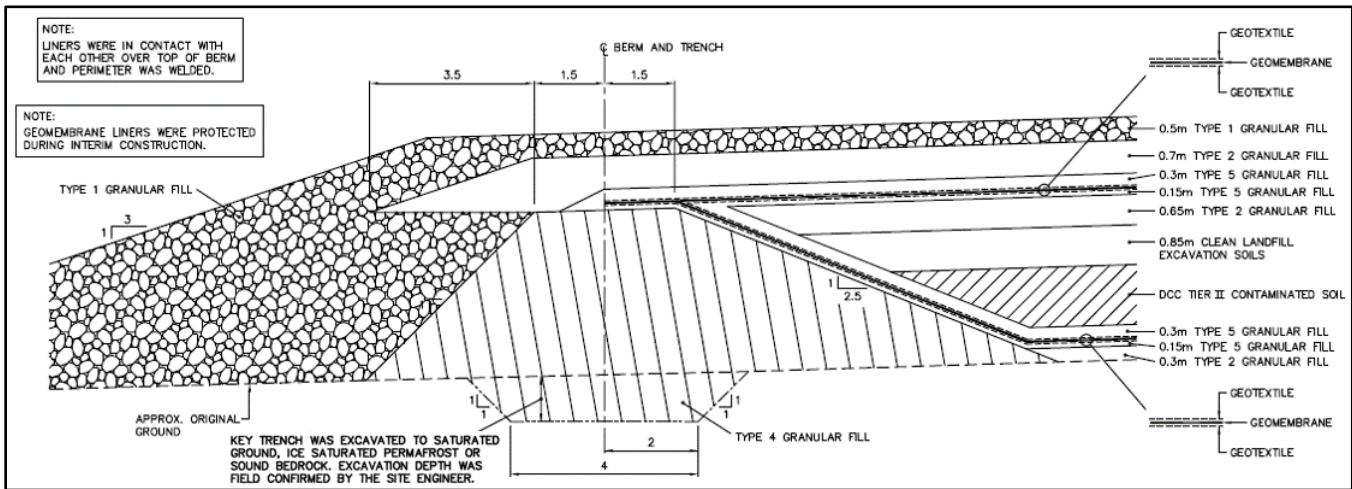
As-built details of FOX-3 Tier II Disposal Facility (AECOM and HATCH 2013).
